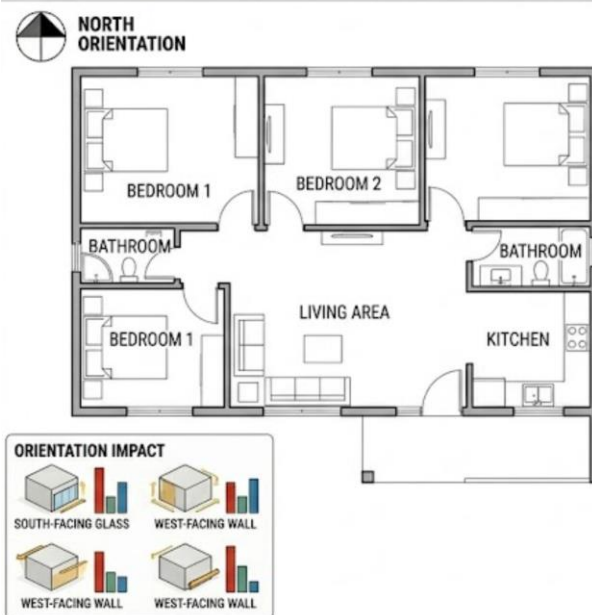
Representative floor plan and solar orientation (Autodesk Revit 2024)
